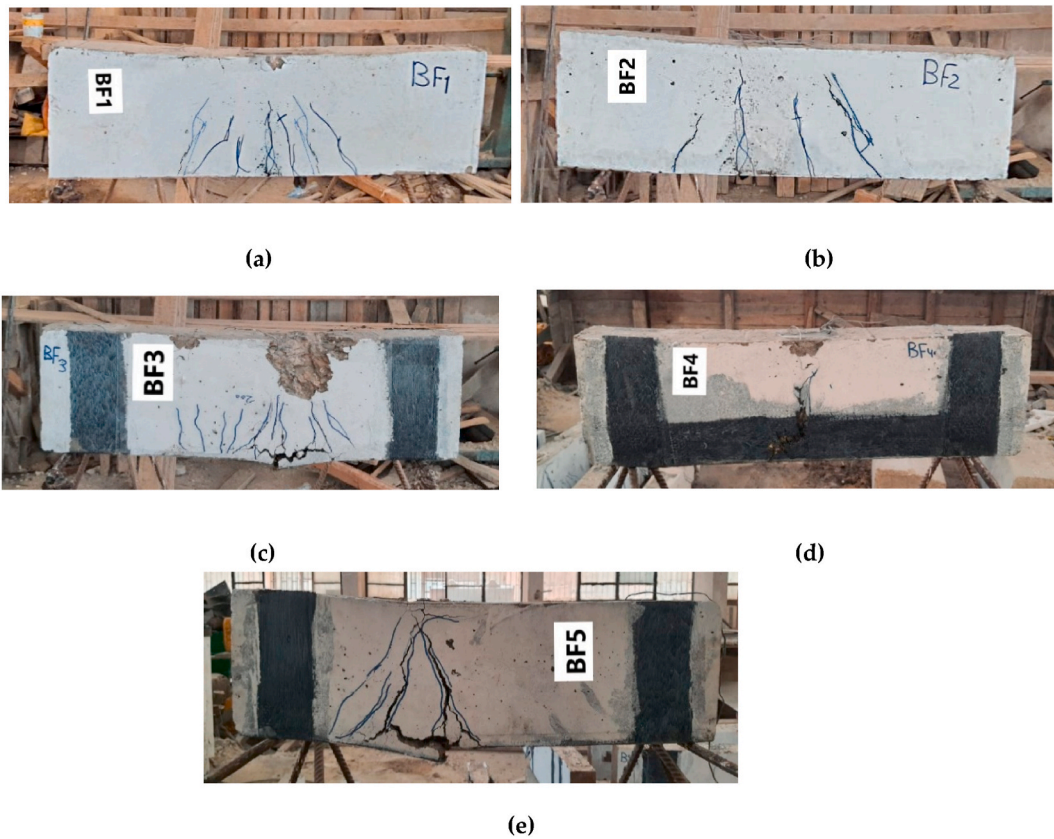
Crack Pattern for Flexural group beams. (a) Crack Pattern for RC control beam BF1. (b) Crack Pattern for GPC control beam BF2. (c) Crack Pattern for strengthened GPC beam BF3. (d) Crack Pattern for strengthened GPC beam BF4. (e) Crack Pattern for strengthened GPC beam BF5.
